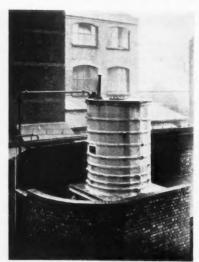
Acid Storage Tank constructed of Nordac patent rubber concrete
